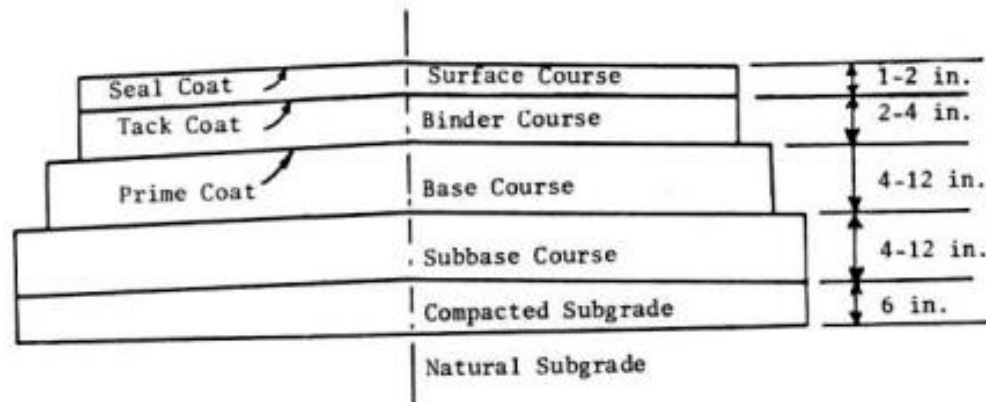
Typical pavement structure (Ordonez, 2006)
